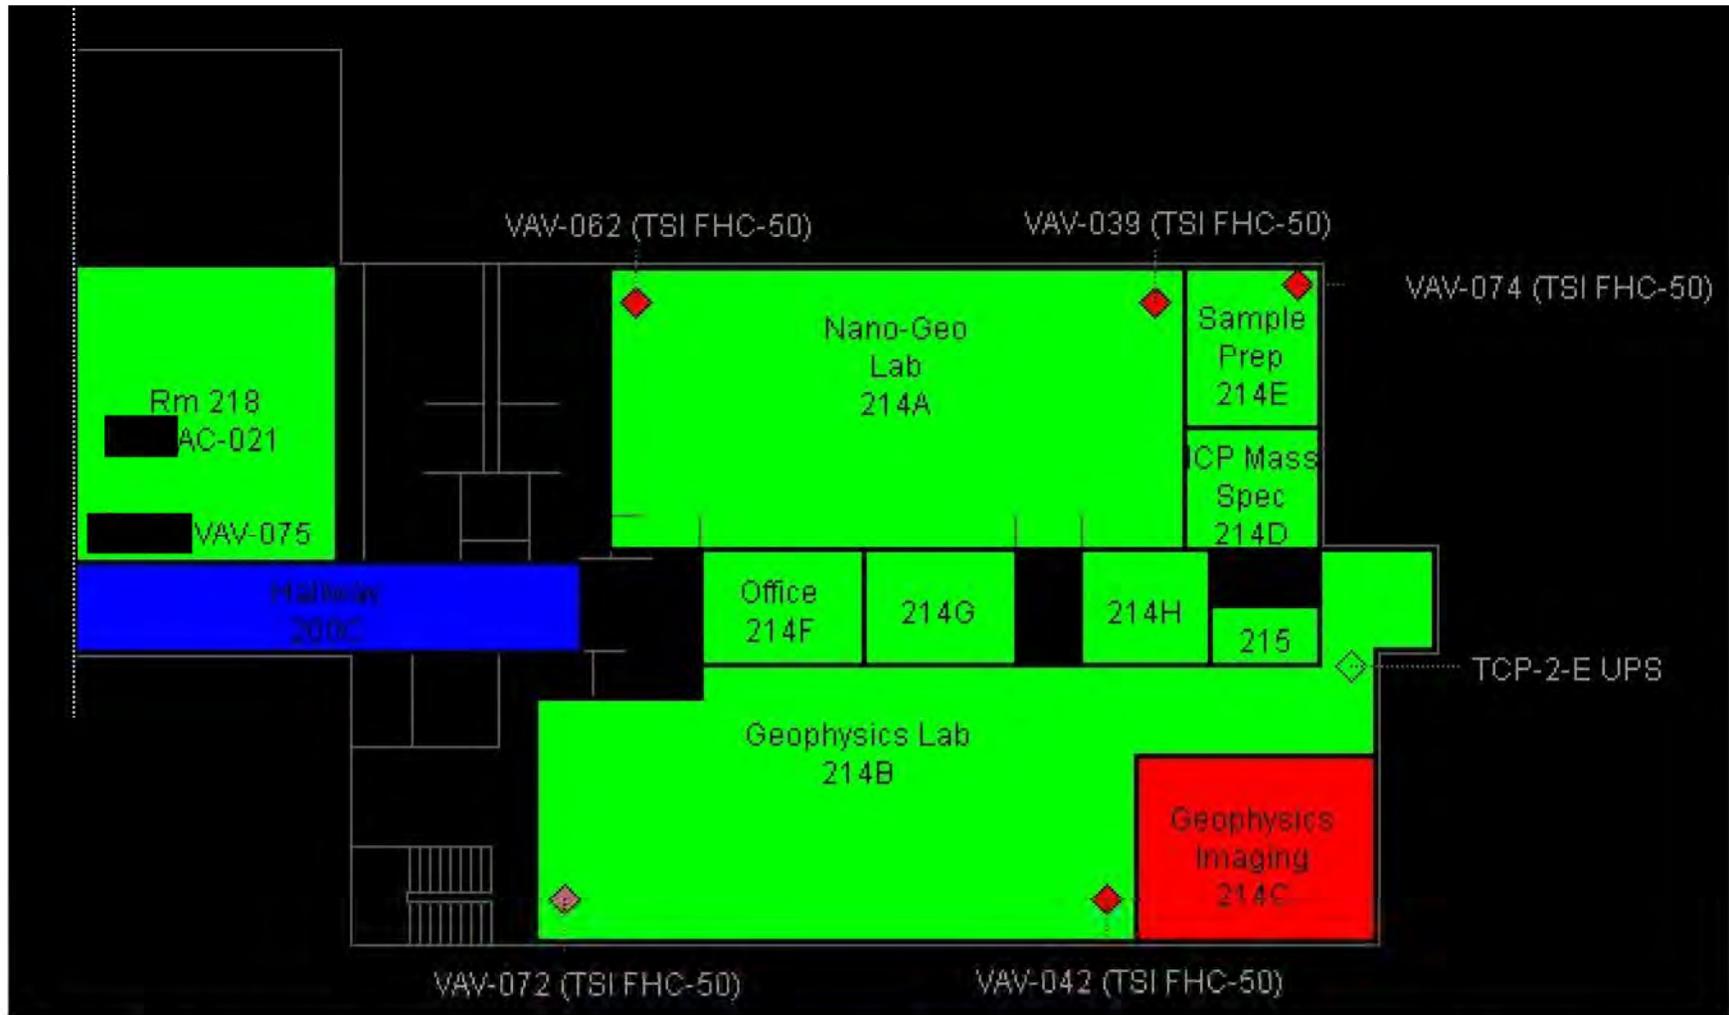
Second Floor East layout, room 214A and B with combined opening at East end to exterior for pressure relief in smoke mode
